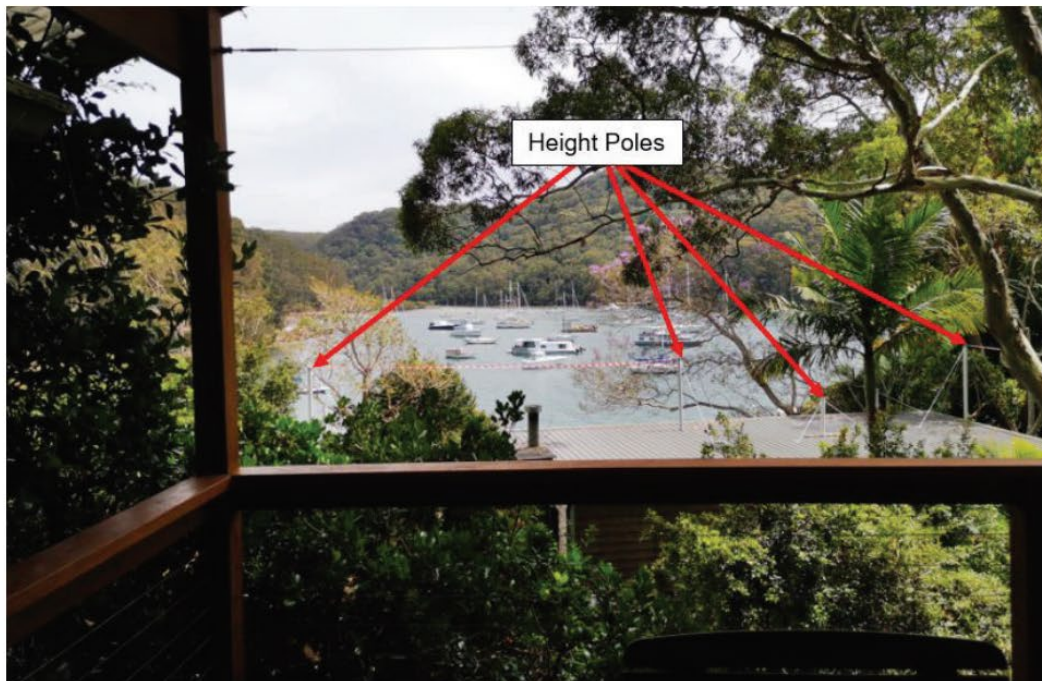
Existing views from No.32 Sturdee Lane to the north-west (ground floor balcony and principle private open space). Height pole indicates extent of view loss from initial proposal (amended plans subsequently received which reduced overall height of the proposed dwelling)
